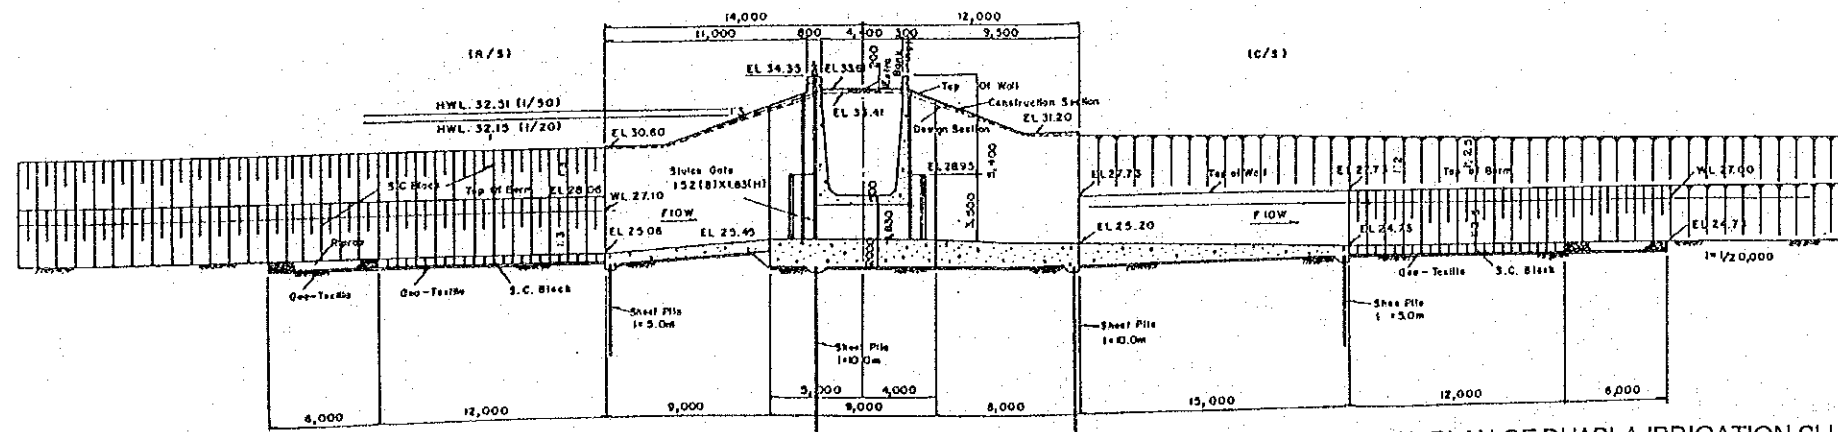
GENERAL PLAN OF ALTERNATIVE -9
